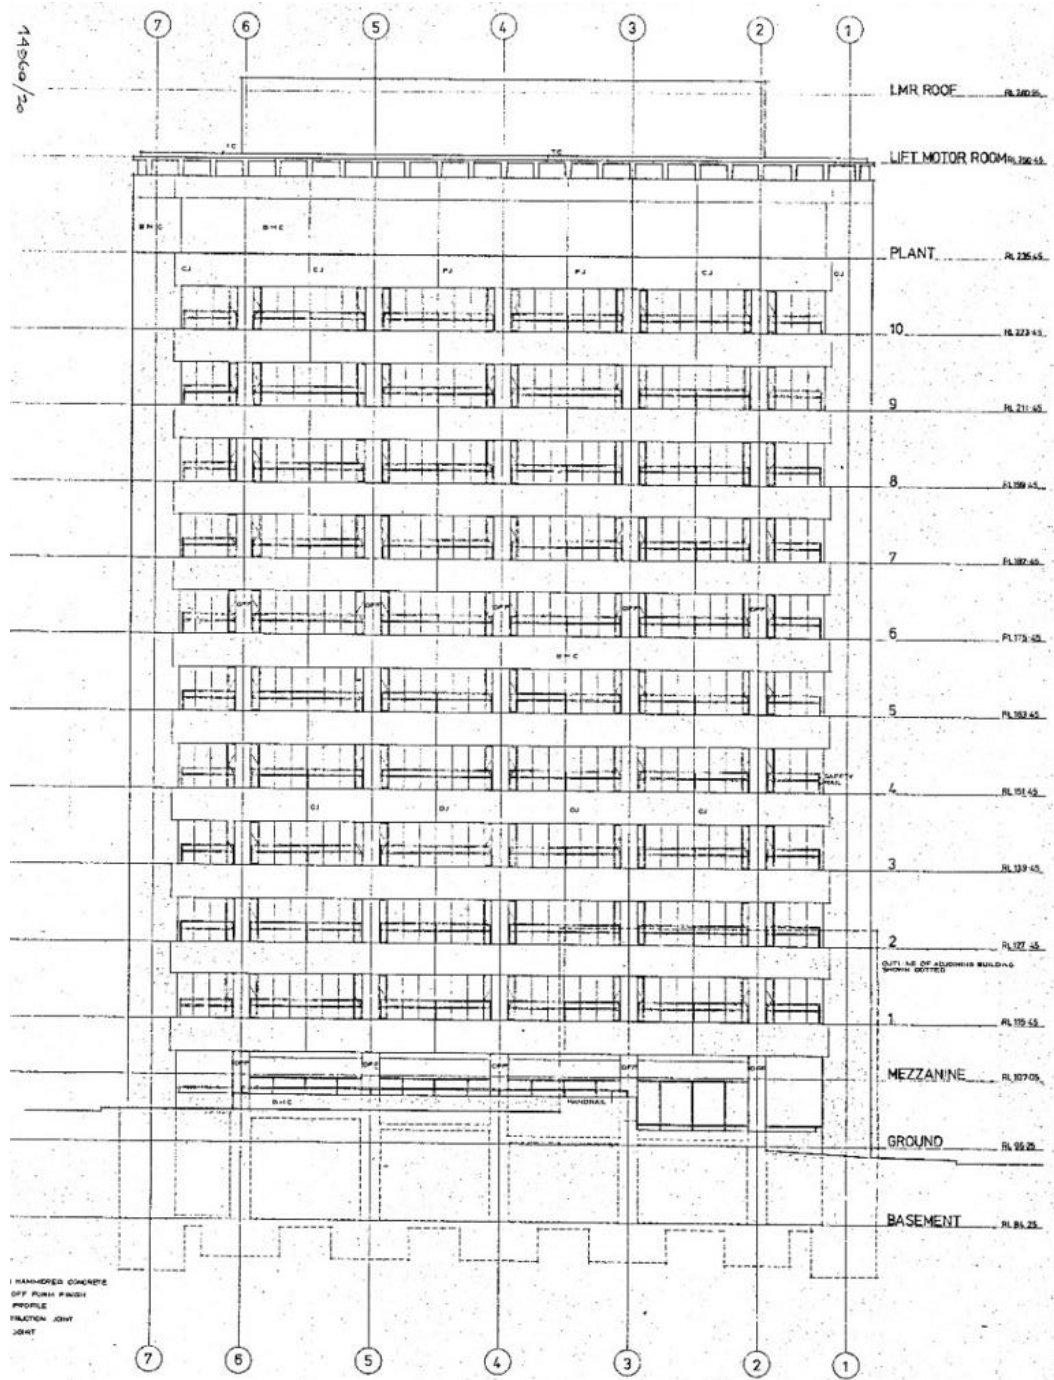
Architectural drawing of the north elevation, dated 1975 (BAP).
